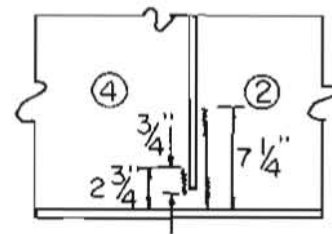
CRACK DETAILS FOR GIRDER 32050 D
